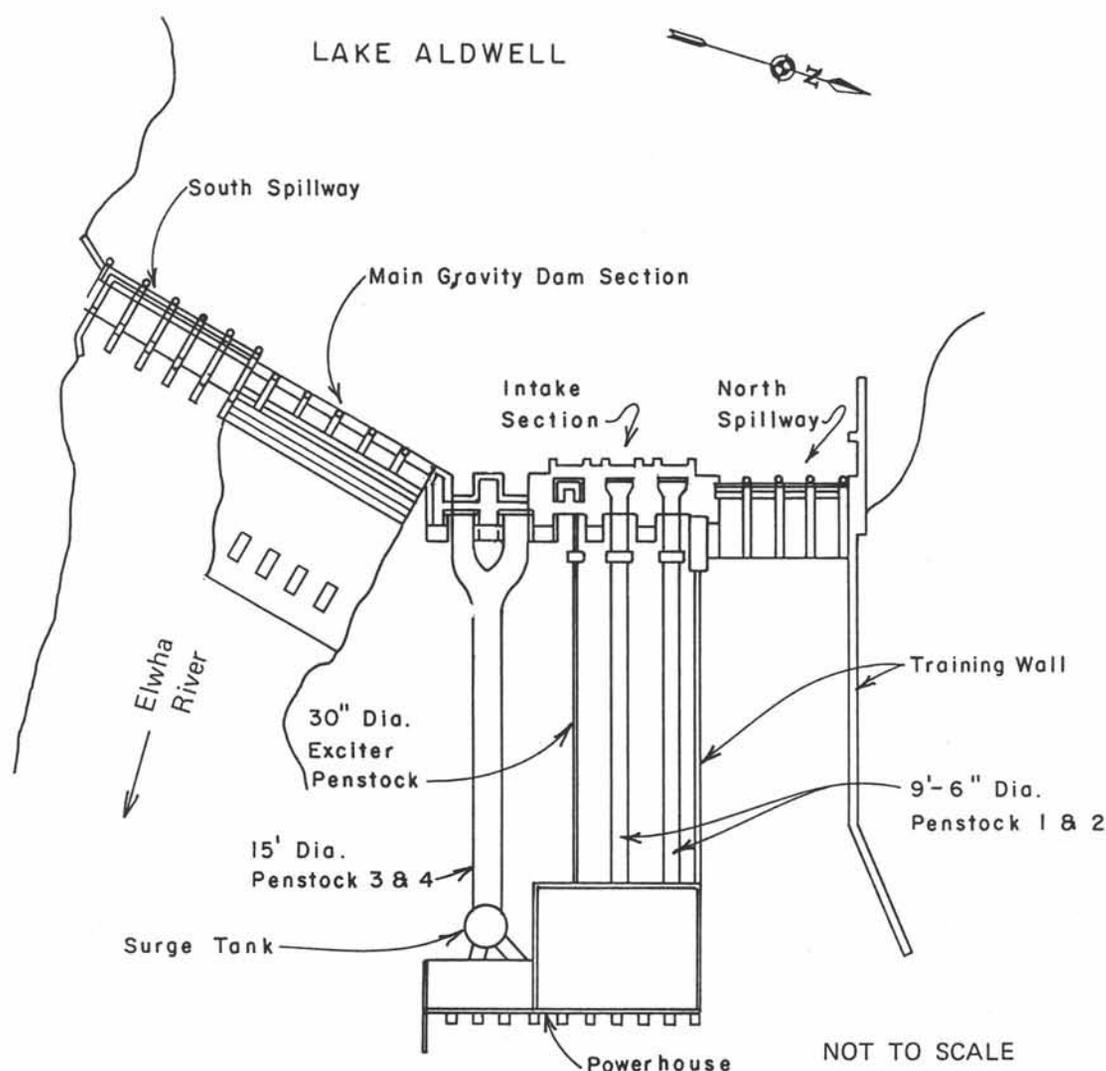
General plan of structures at the Elwha Dam. Adapted from U.S. Army Corps of Engineers (1978).
